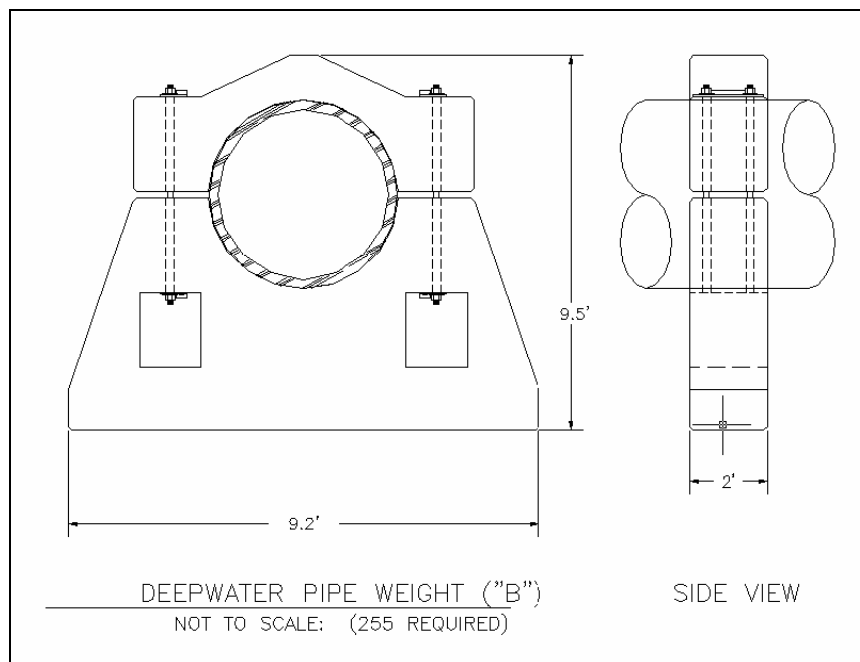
Typical Anchor Collars for Use on an HDPE Pipeline
